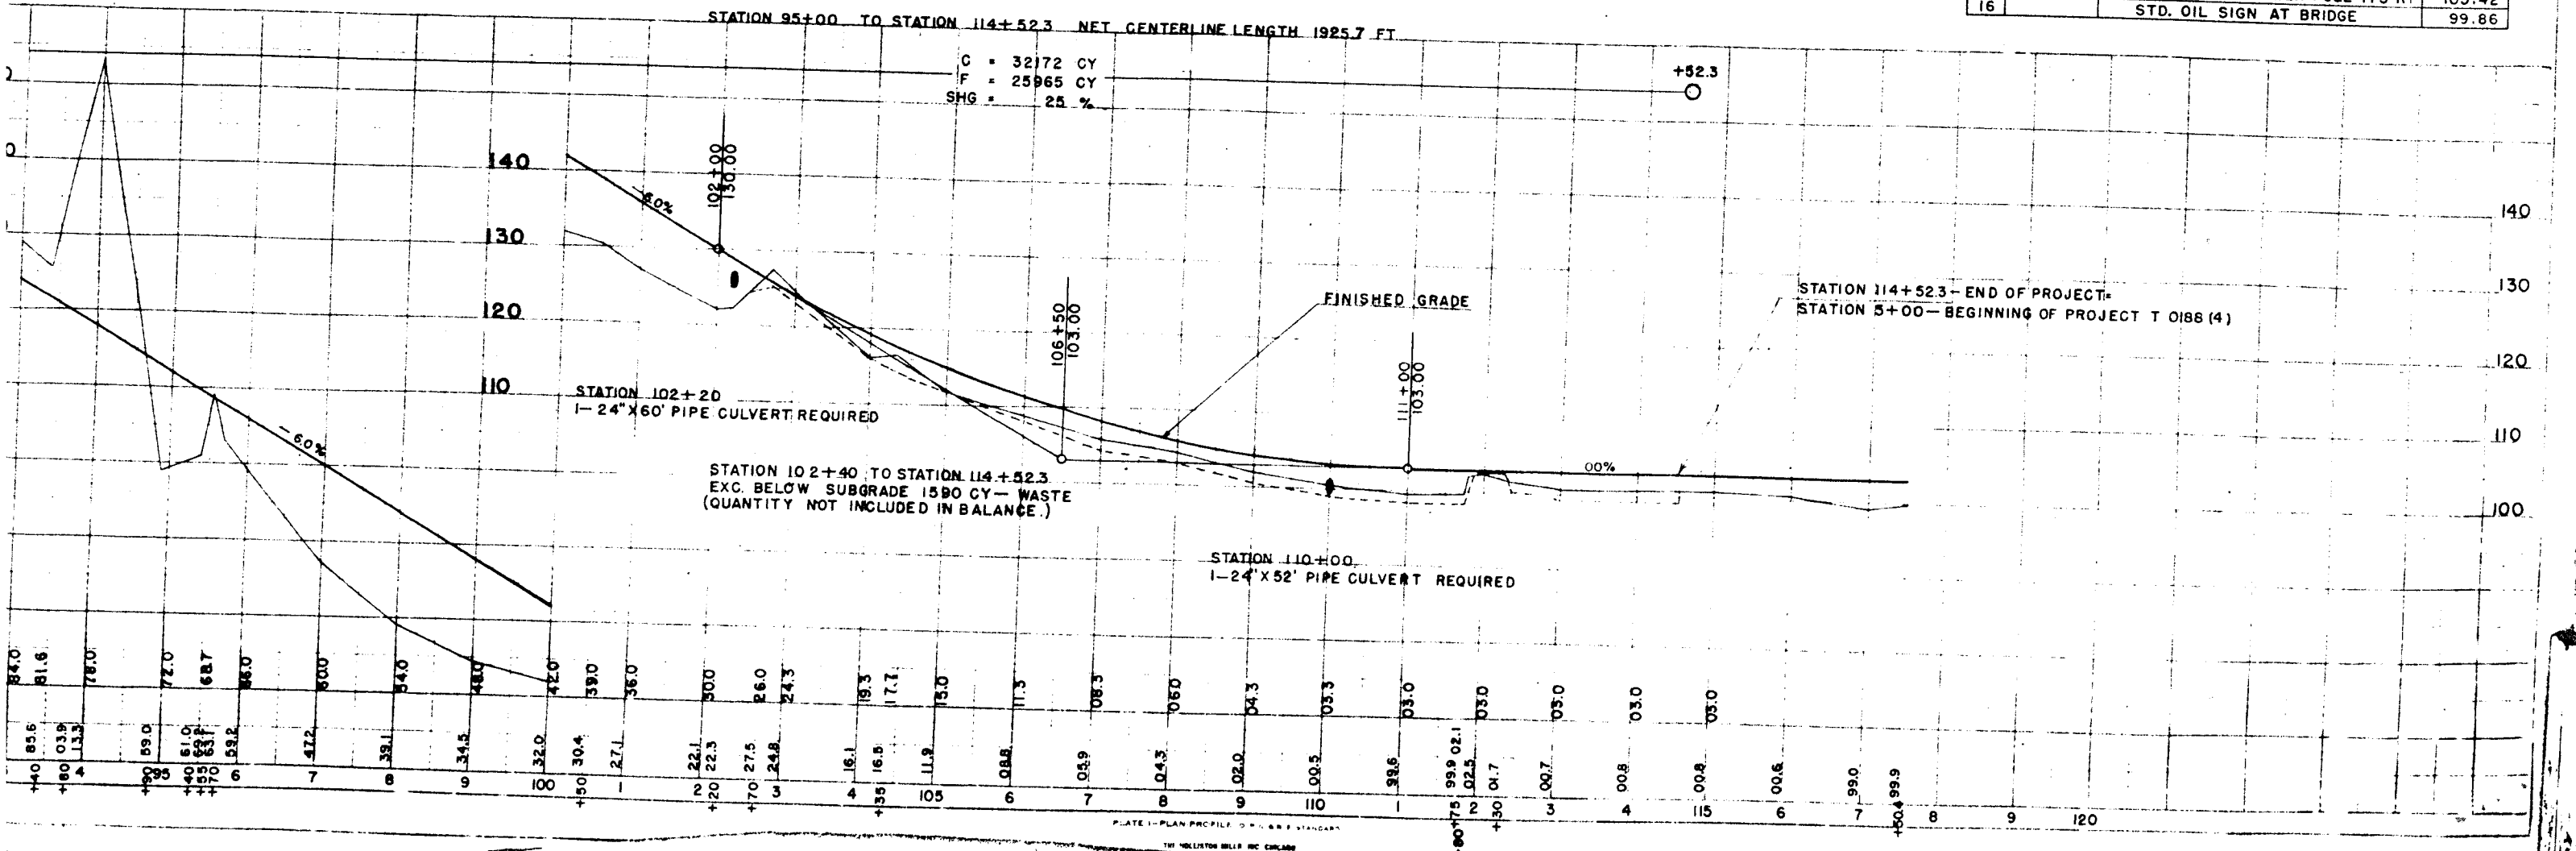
PLAN PROFILE OF ROAD STANDARD
